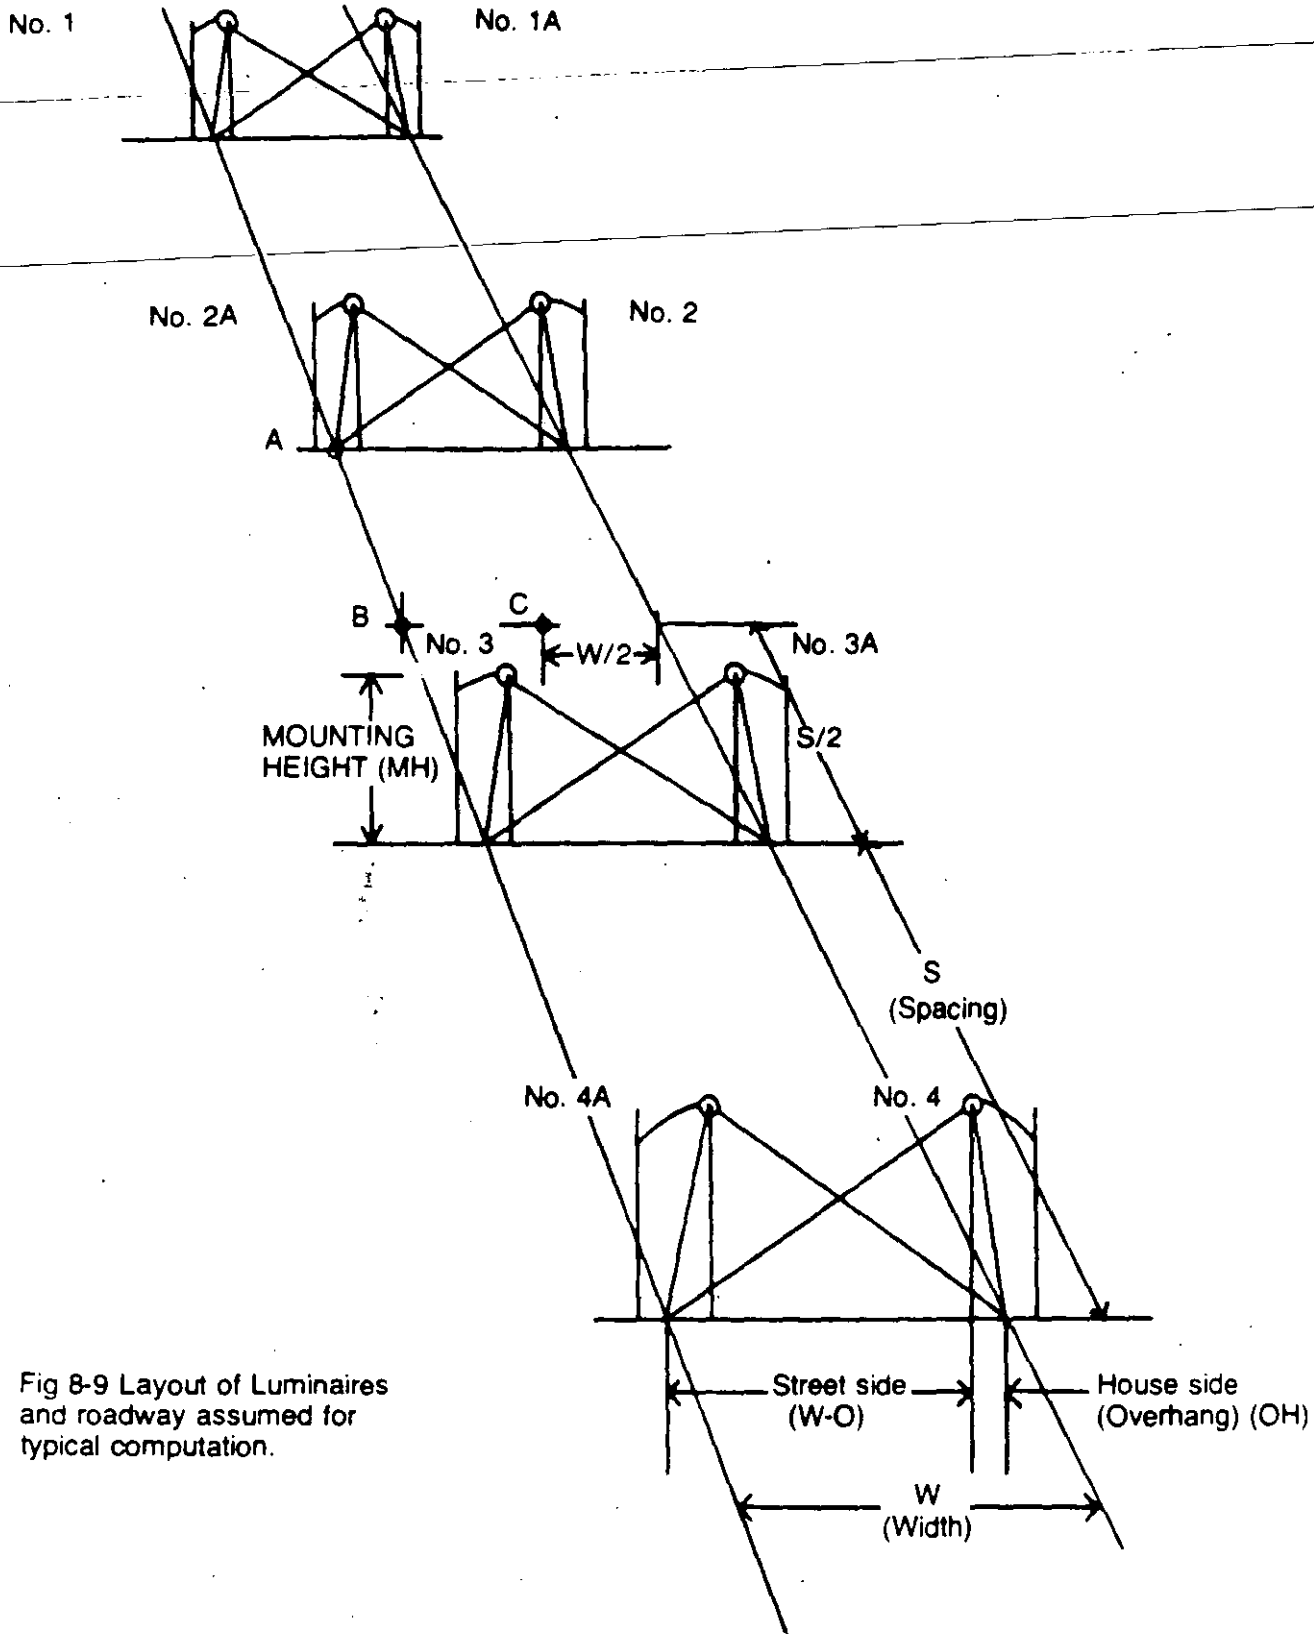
Layout of Luminaires and roadway assumed for typical computation.
